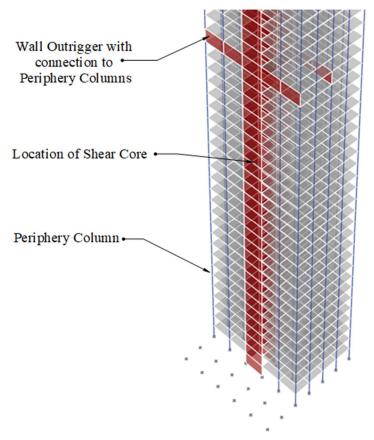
With wall outrigger - 3D cutout view of the tall structure
